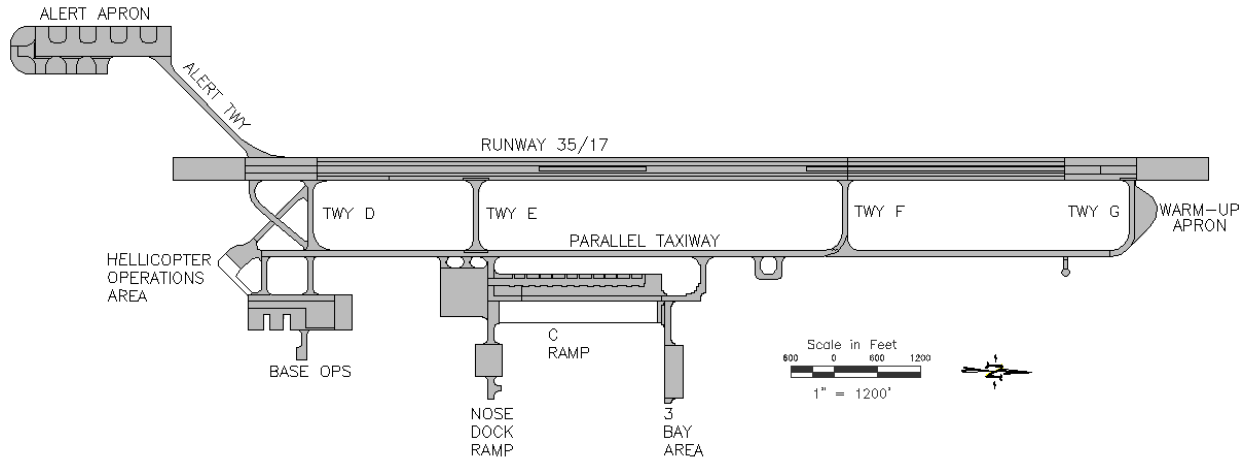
Layout of airfield pavements at Grand Forks AFB.
